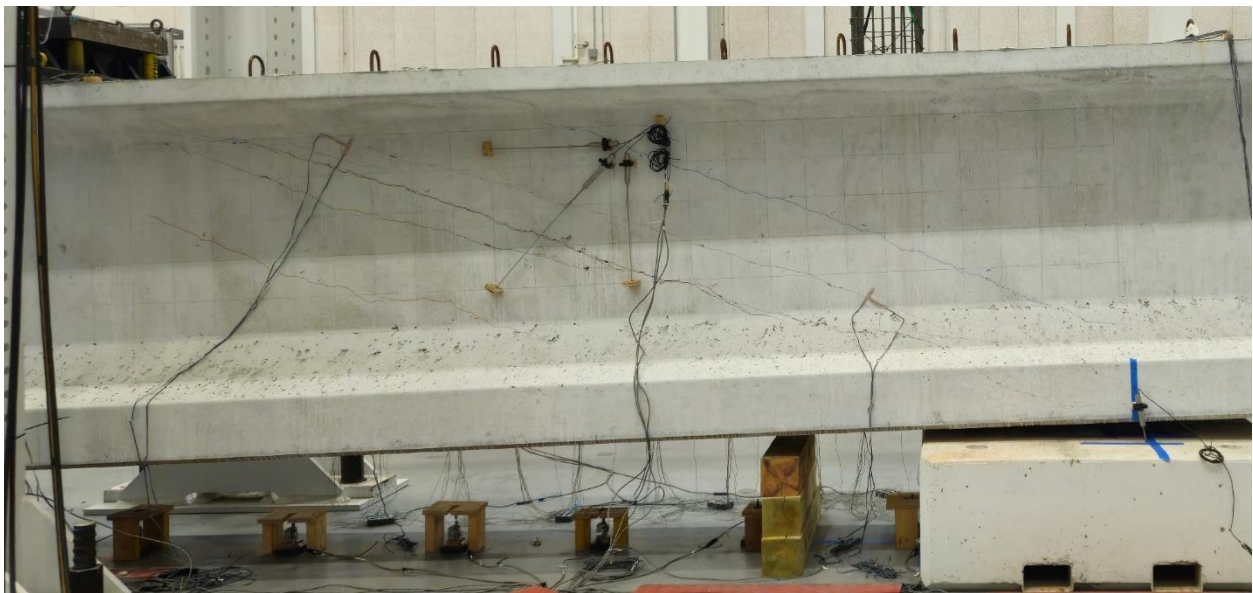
East side of G7 girder at cracking load.
